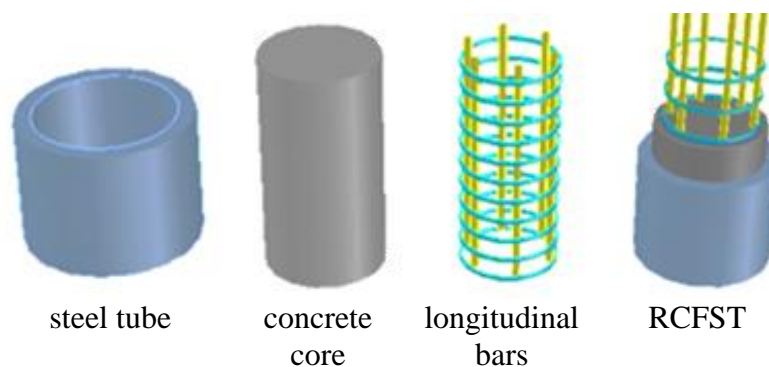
Reinforced concrete-filled steel tubular columns – RCFST.
